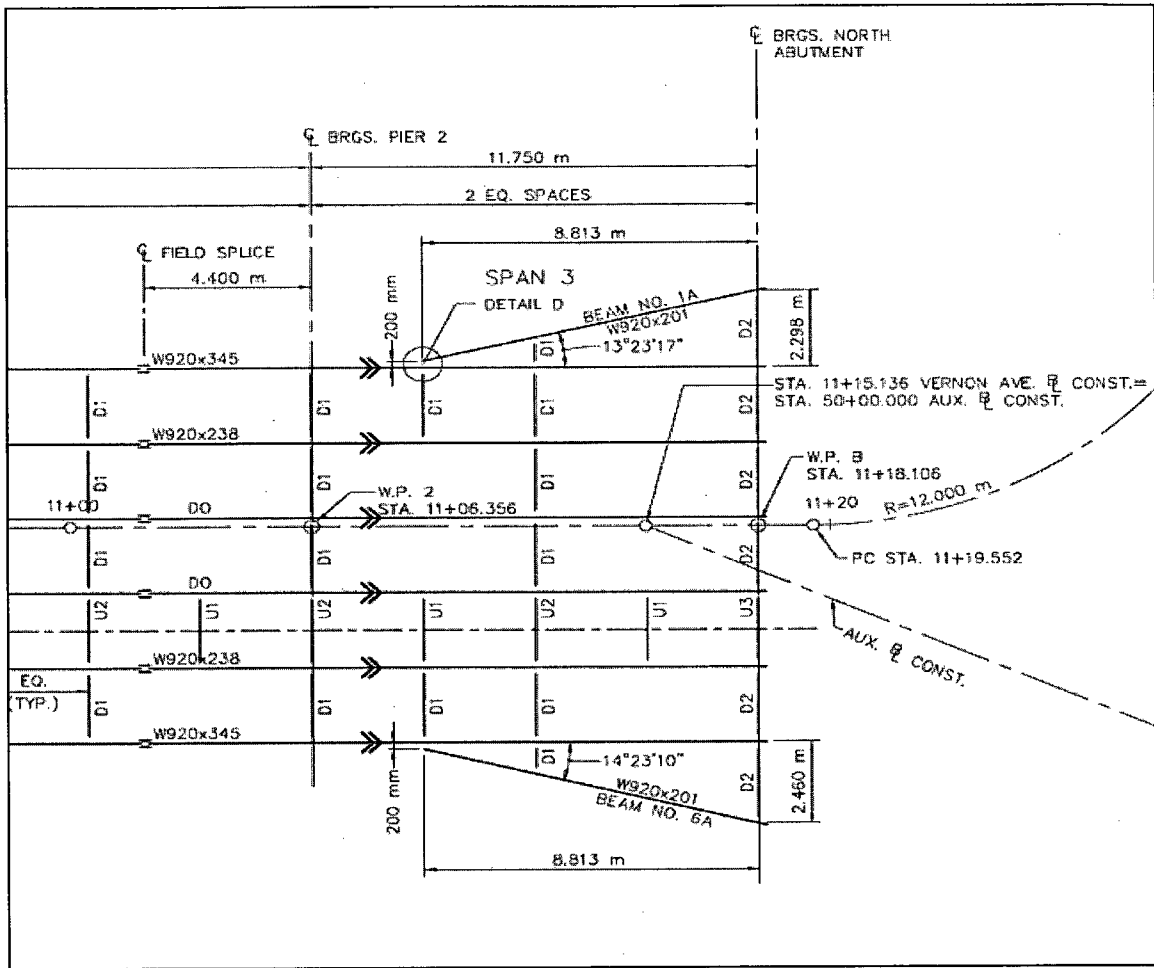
Varying deck section as given by design framing plan (FST, 2007)
